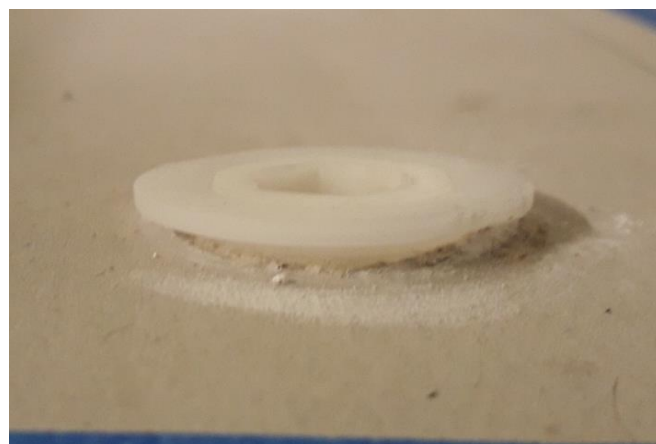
Slight pull out of PC-DC1 anchor under clip set test.
